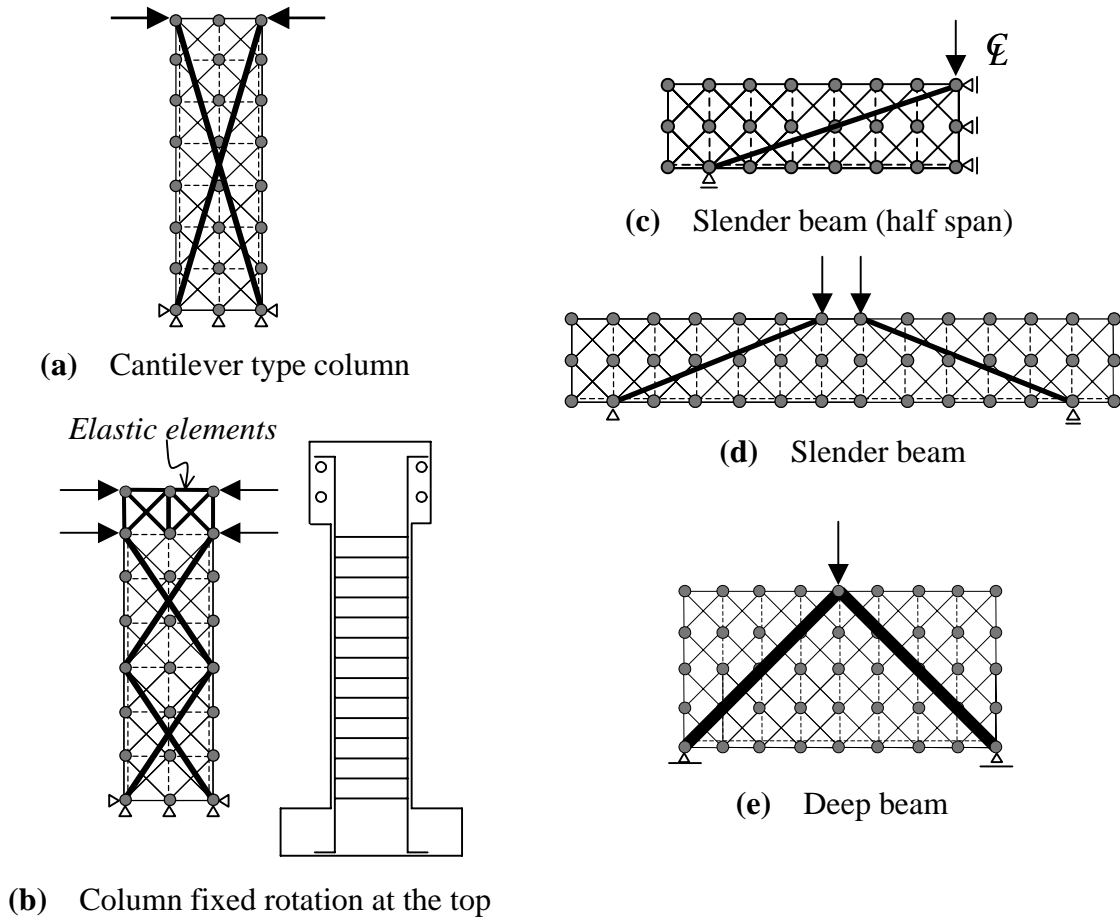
Cross section of RC column modeled by the 2D lattice model
